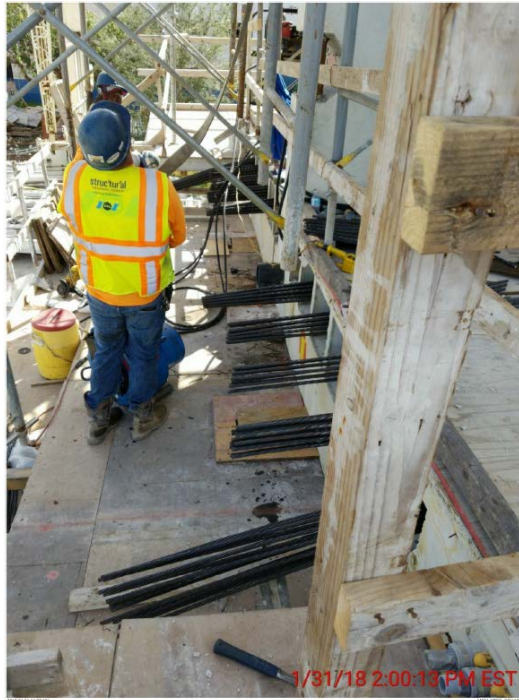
January 31, 2018: Deck PT stressing.⁸⁵
